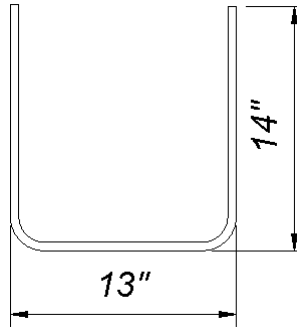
Top Repair Reinforcement Shape & Dimensions
